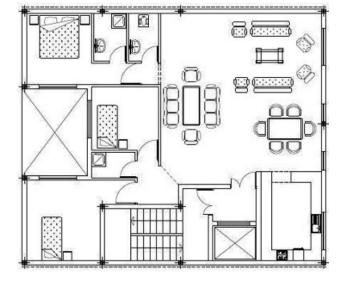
A typical plan of apartment houses pattern. Source: authors.
